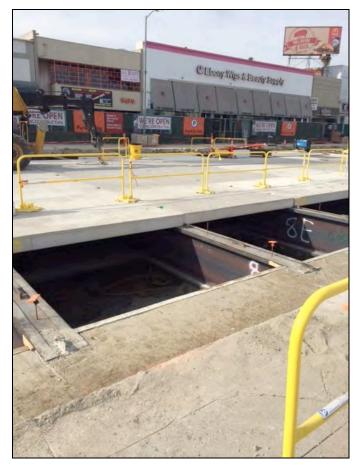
Example of Tunnel Portal Beam Installation
